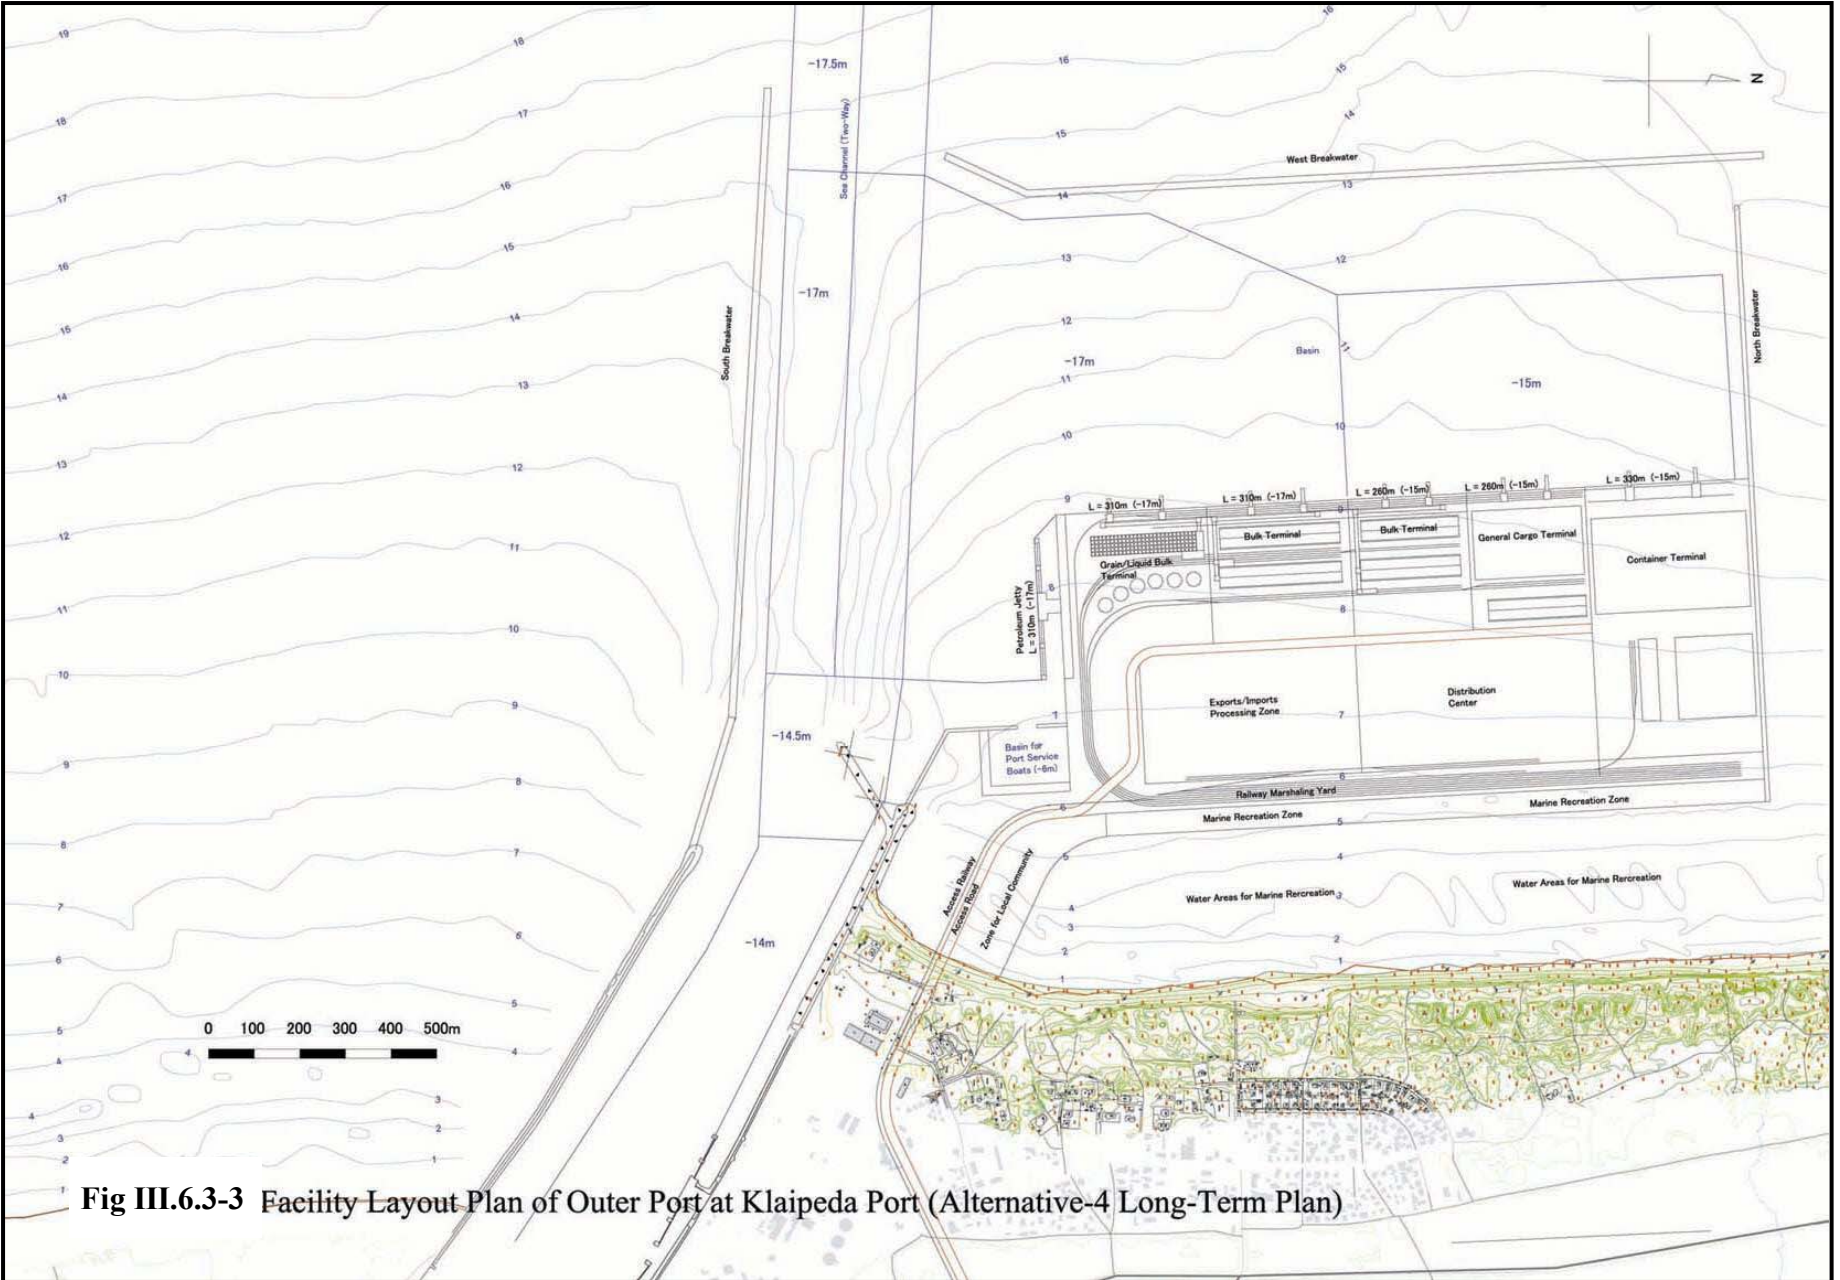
Facility Layout Plan of Outer Port at Klaipeda Port (Alternative-4 Long-Term Plan)
